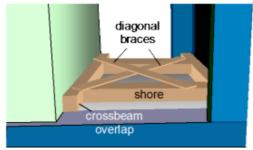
Shoring arrangement showing cross beam overlap and diagonal braces
